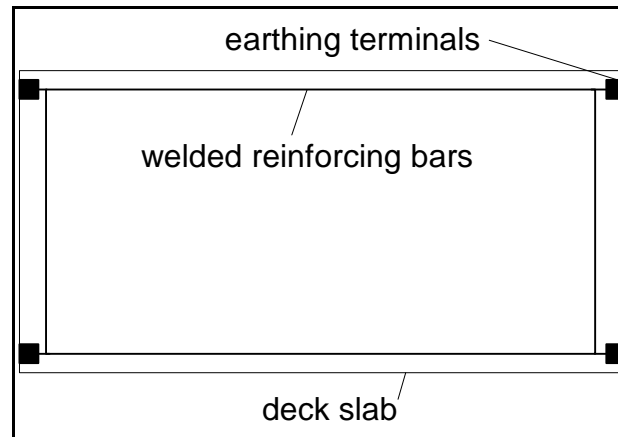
Example of Earthing Measures for Precast Wall Panels or Deck Slabs
